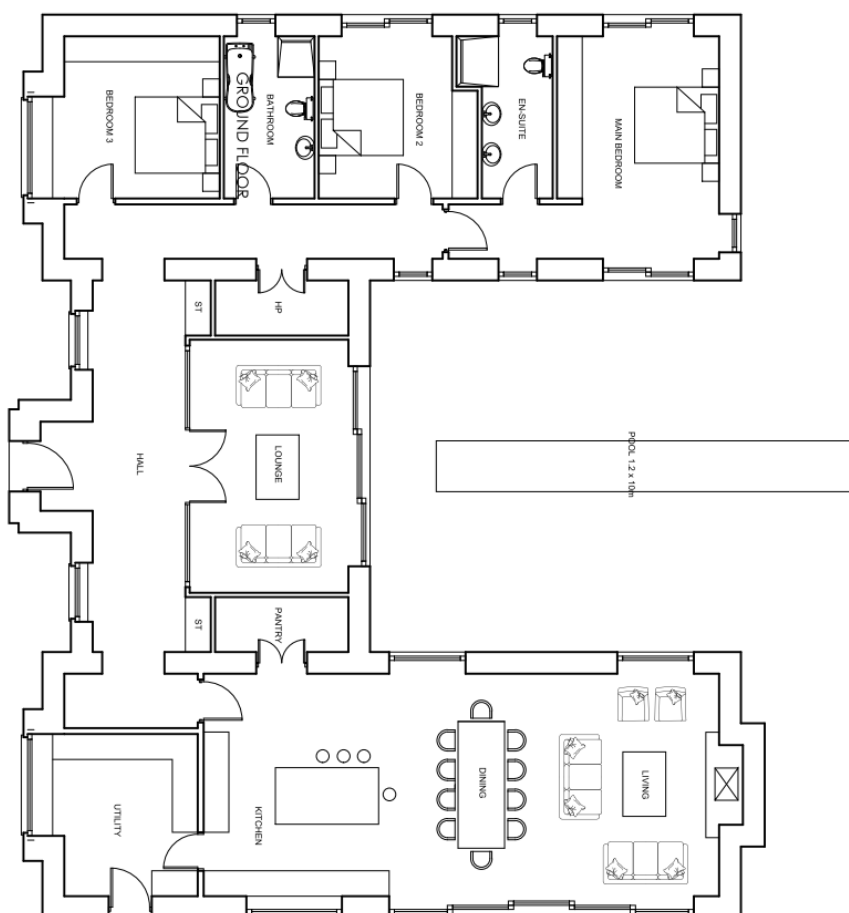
Extracts Drawing LA06/2024/0222 08C – Proposed Site Plan & 06A – Proposed Floor Plan
